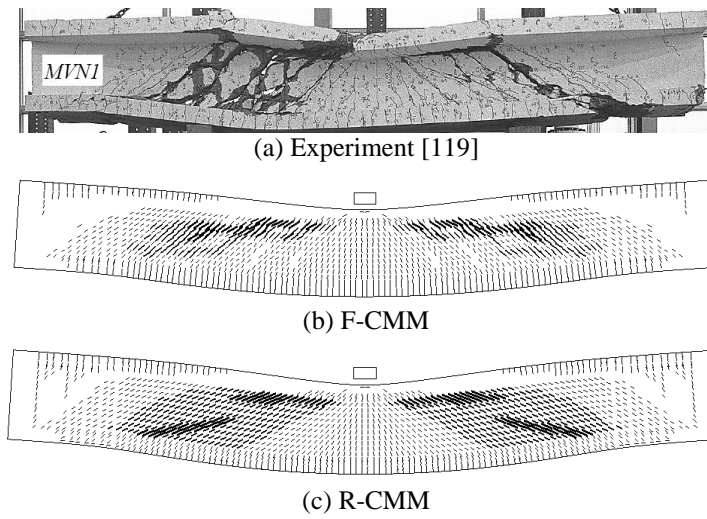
Beam MVN1: cracking patterns at failure.
